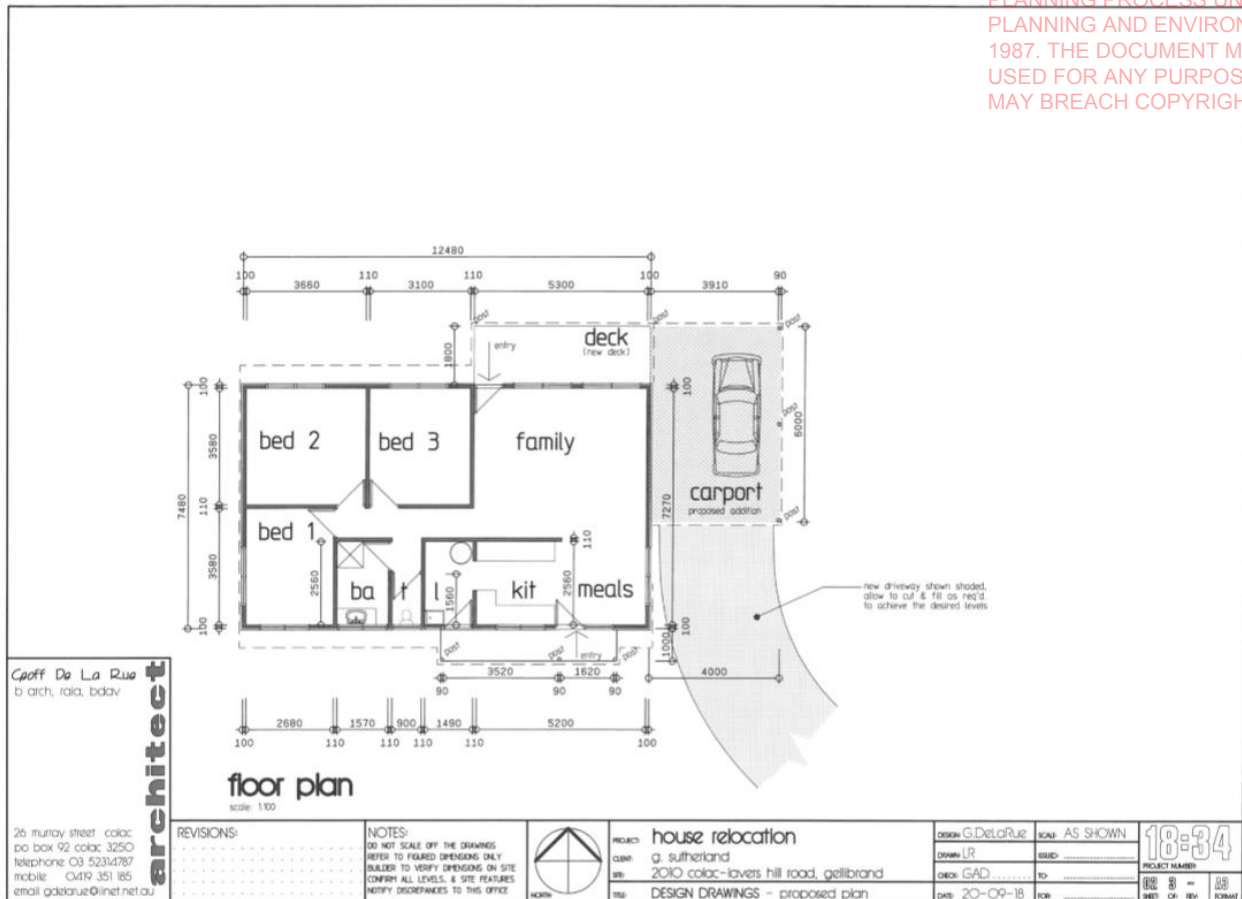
Floor plan indicating a potential 3-bedroom home (Source: Geoff De La Rue 2018).
